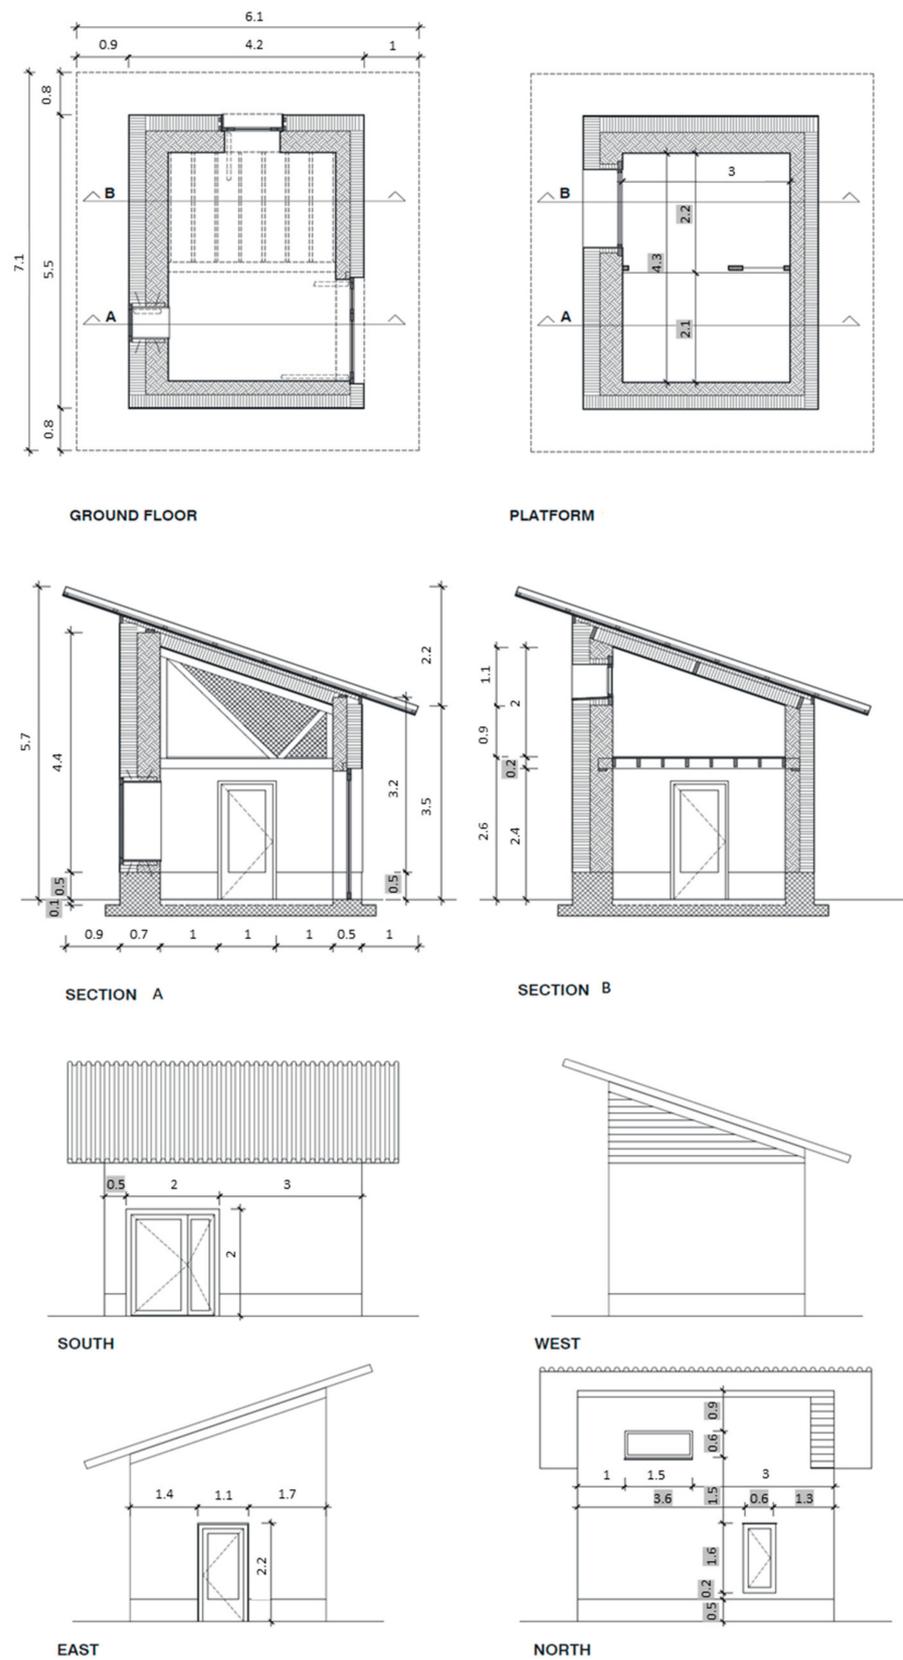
Architectural plans of the prototype building. Sections A and B were obtained at positions A and B indicated on the views of the ground floor and platform.
